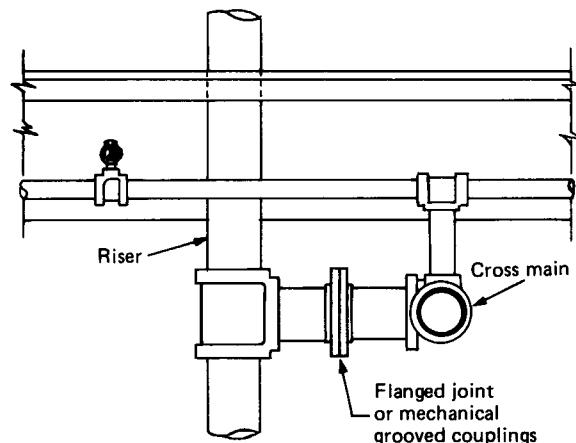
One arrangement of flanged joint at sprinkler riser.
